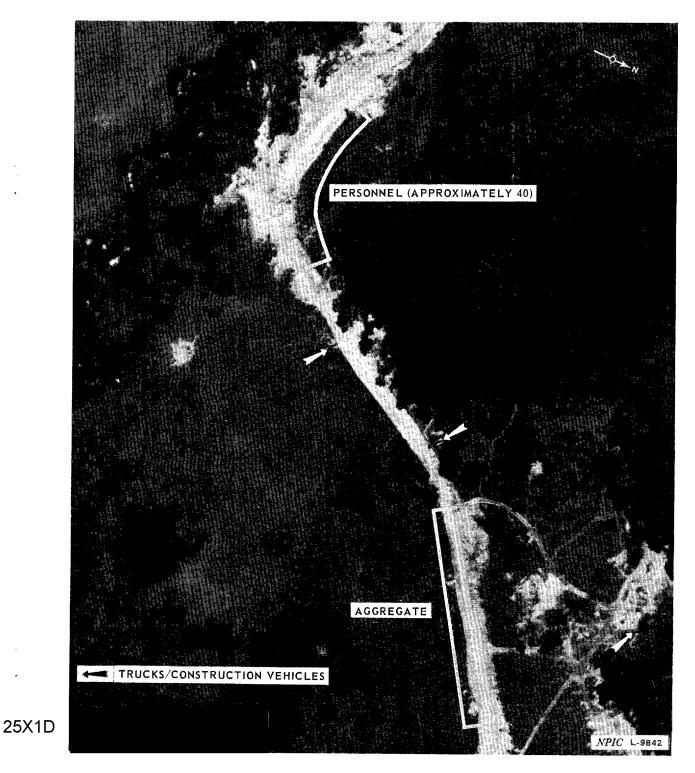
ROAD IMPROVEMENT, ROUTE 19, NORTH VIETNAM
